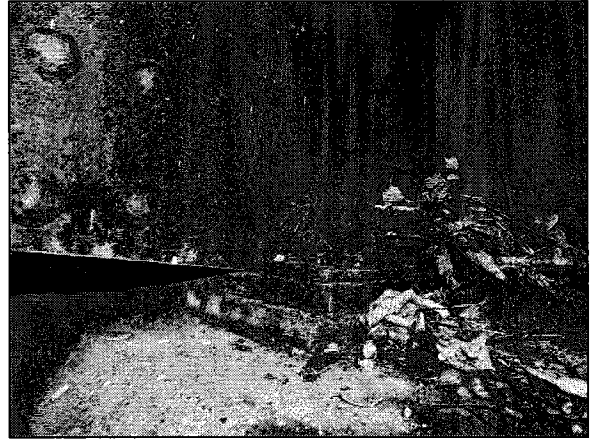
Typical Condition of West Abutment (good condition – localized spalling)
